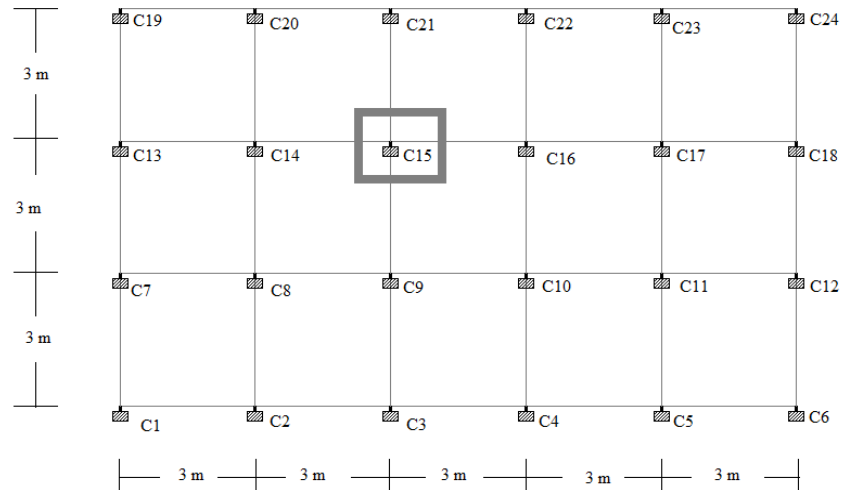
Plan of the public building (Govalkar. V et al (2014))
